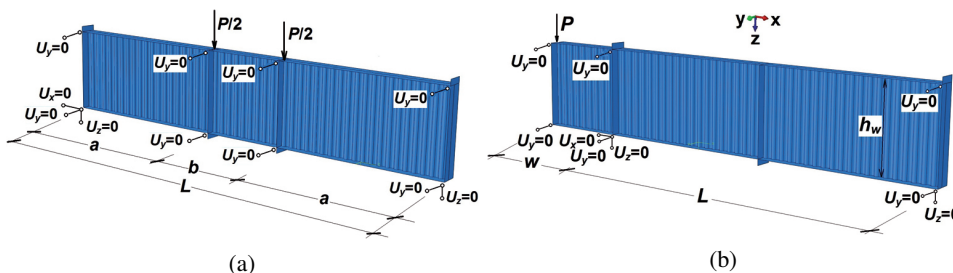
Boundary conditions of numerical girder: a) beams models b) cantilever models
